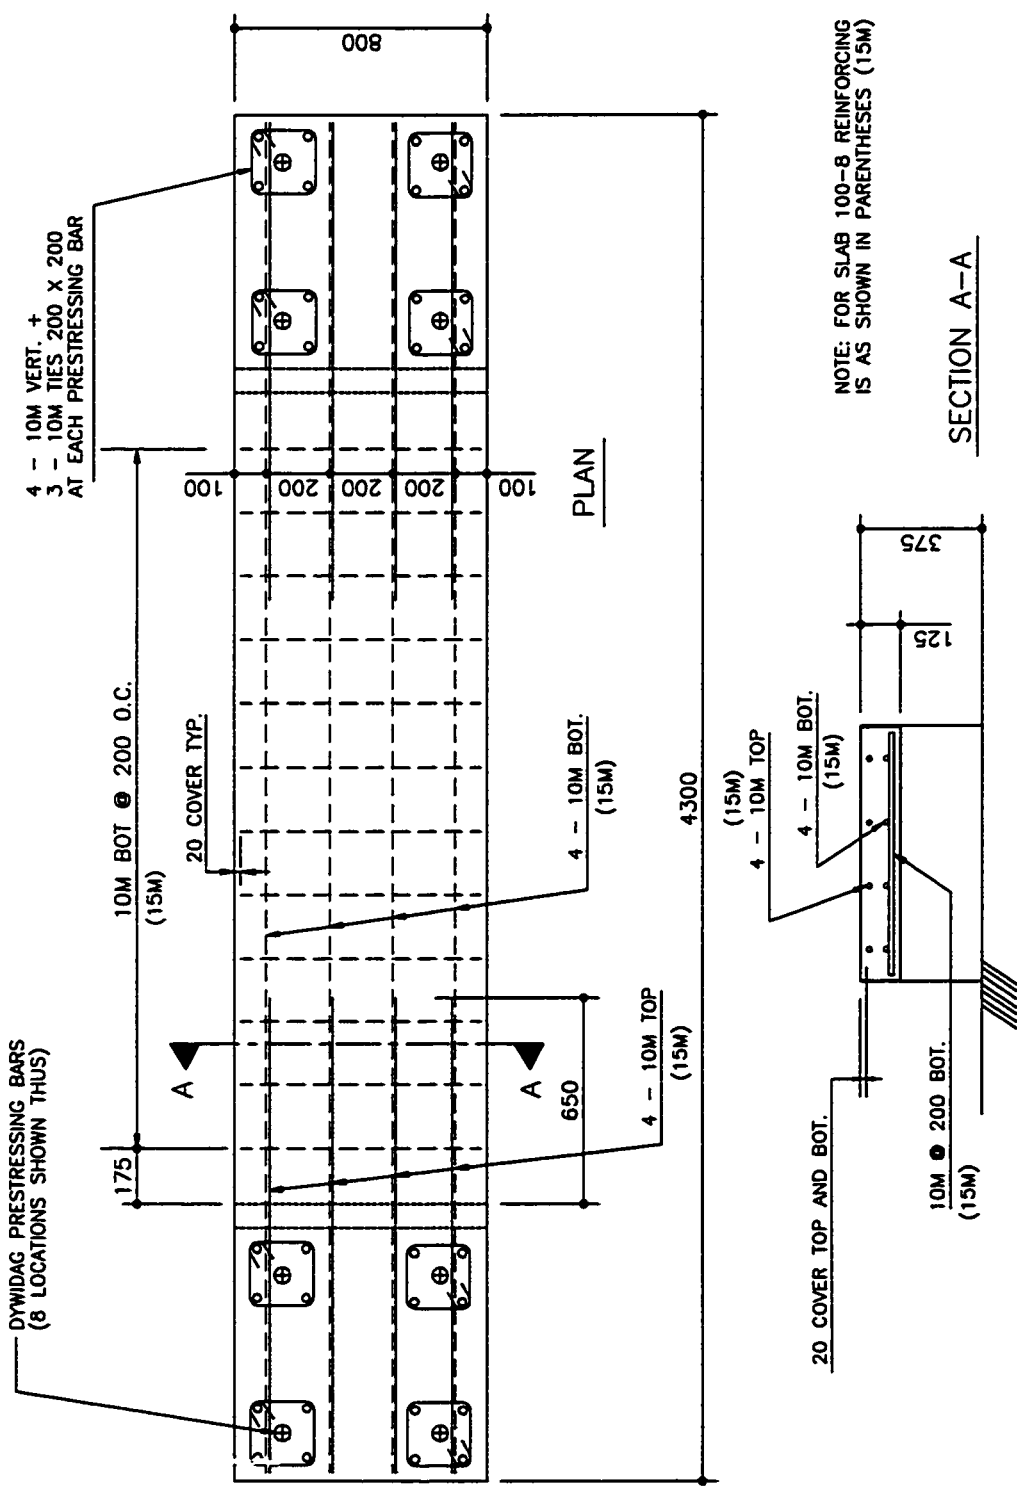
Reinforcement for slabs 30-4, 100-4, and 100-8
